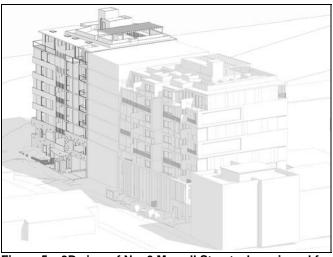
3D view of No. 6 Murrell Street when viewed from the street
